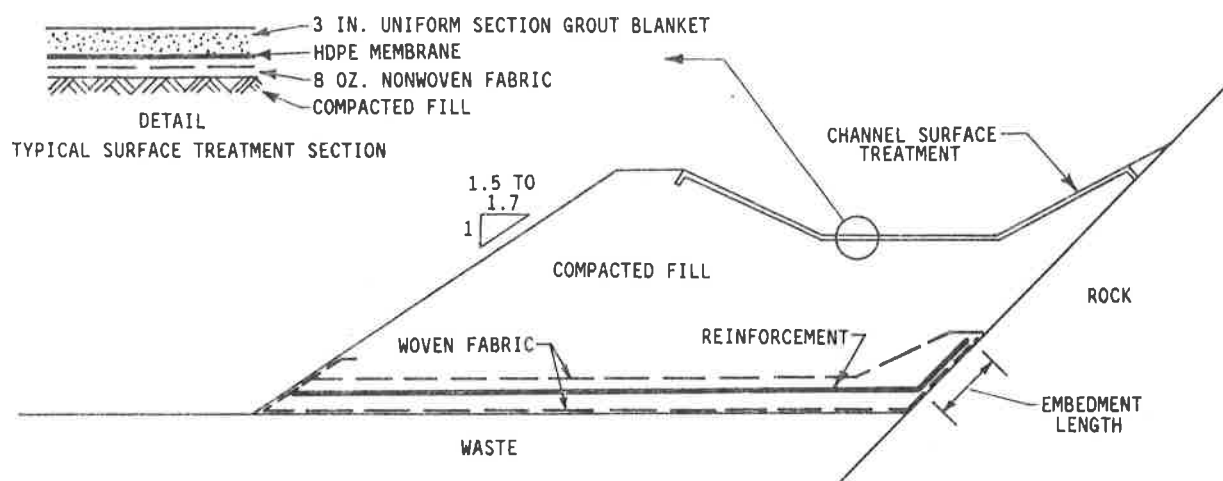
AS-CONSTRUCTED SECTION DETAIL
